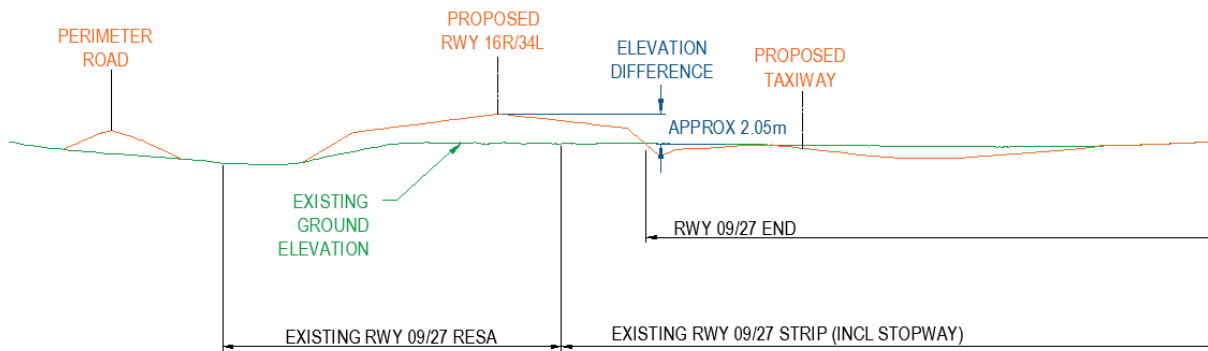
Cross Section of the existing runway 09/27 with the proposed elevation of runway 16R/34L
